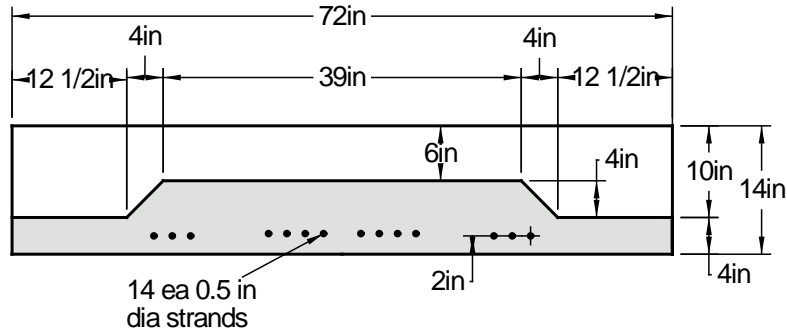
Typical Composite Bridge Cross-Section for a 20-ft Long Span (Mild Reinforcing Not Shown). Note: each = each, dia = diameter.
